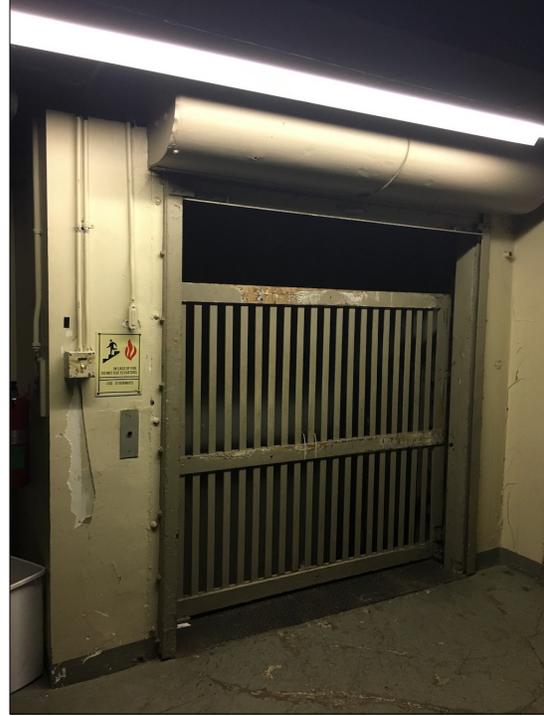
Subject property, Building A, interior, basement, freight elevator (McGee, 2017)
